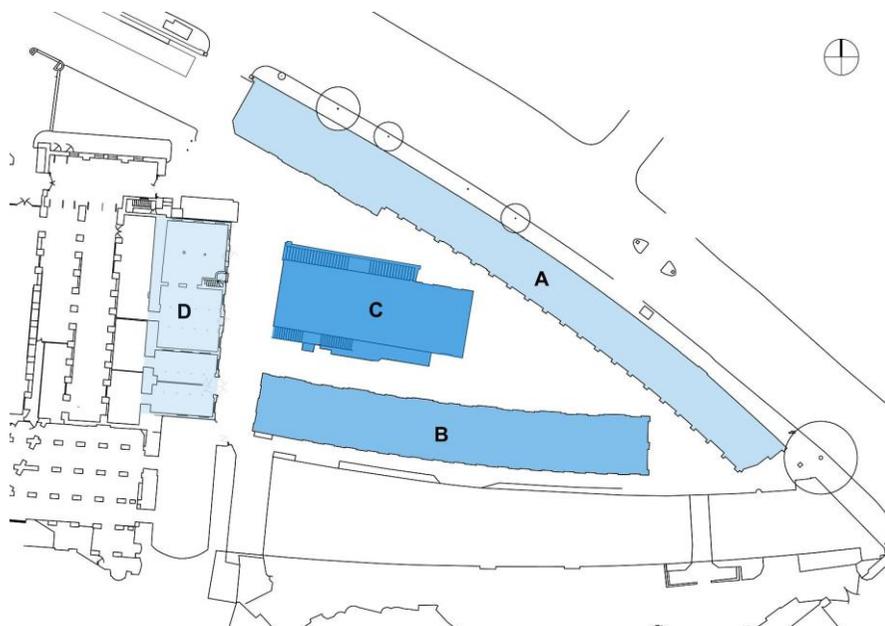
Stables Market - Four western ranges, subject site Building C. The Triangle site is formed of buildings A, B, C and D.
